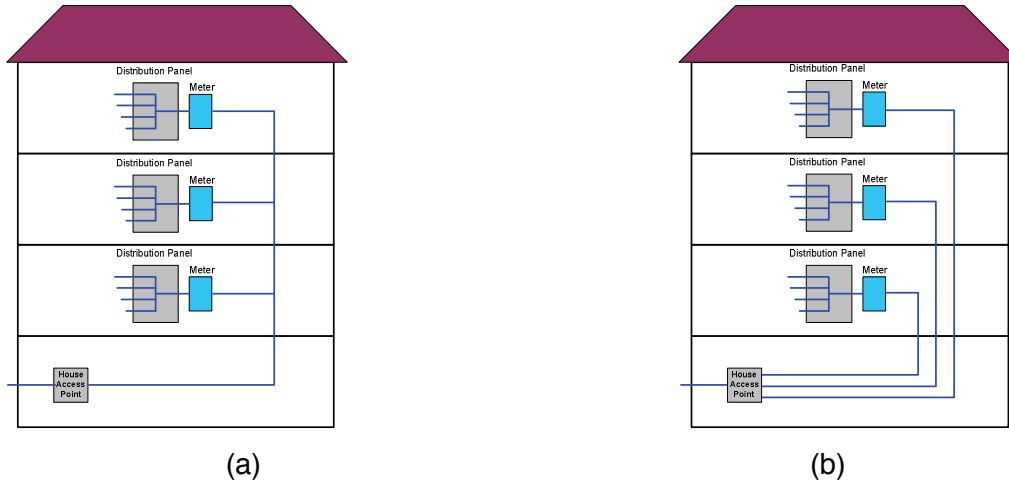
Multi-flat building with riser: (a) building subtype 1- the single riser supports all the floors and (b) building subtype 2- the separate risers are going from the House Access Point (HAP) to each floor.
